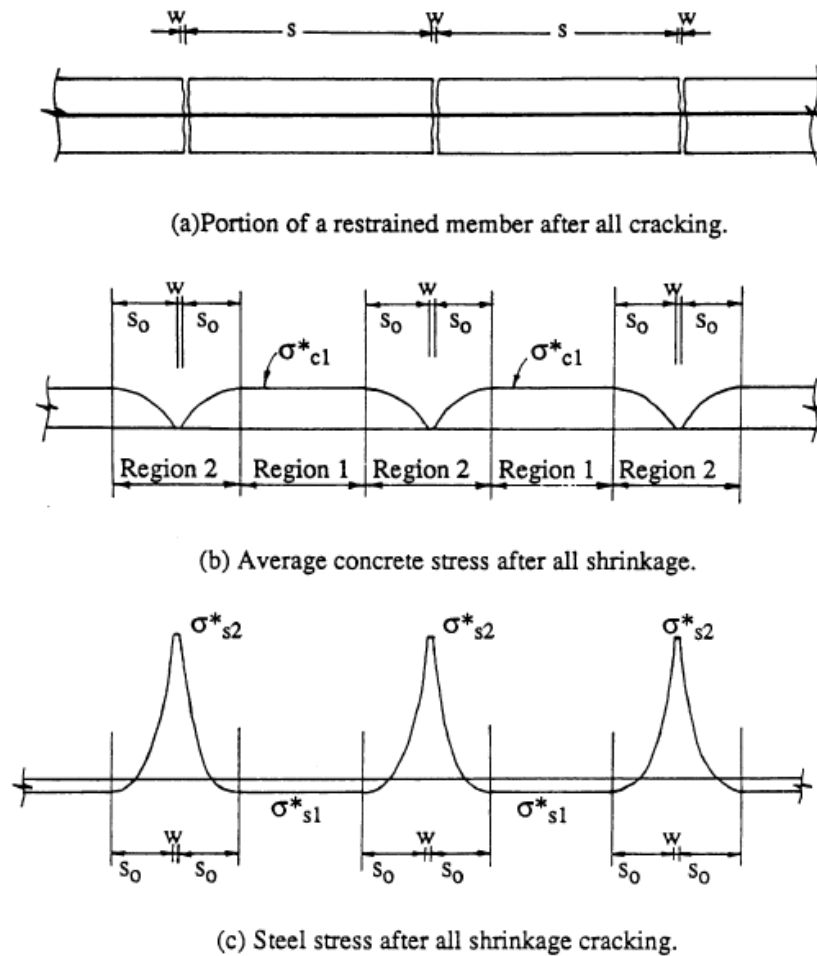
Final Cracking Illustration (Gilbert 1992)
